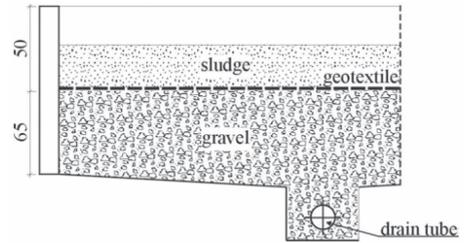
Cross-section of the proposed drying bed using geotextile layer.
